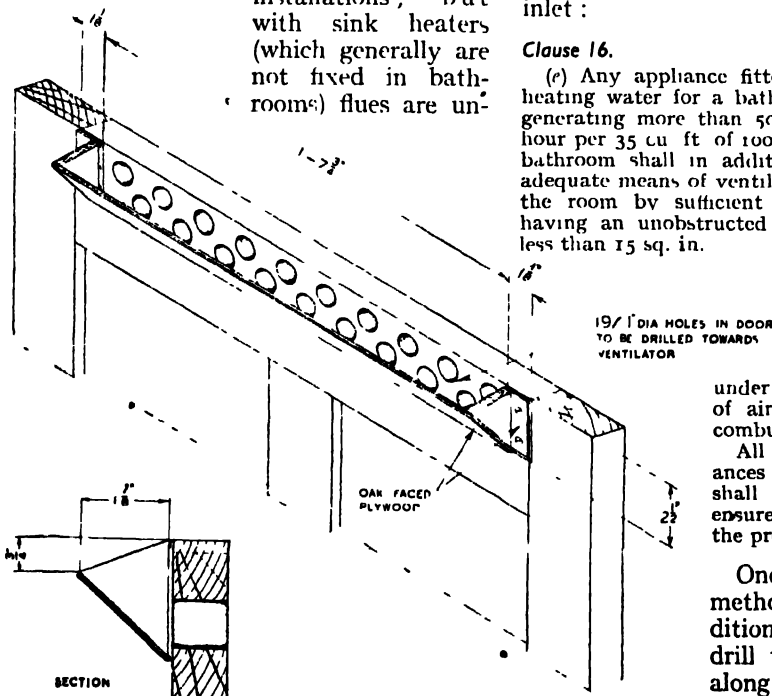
Ventilation drillings in top of bathroom door, with cover plate fitted to conceal holes; (left) section through door and plate.
